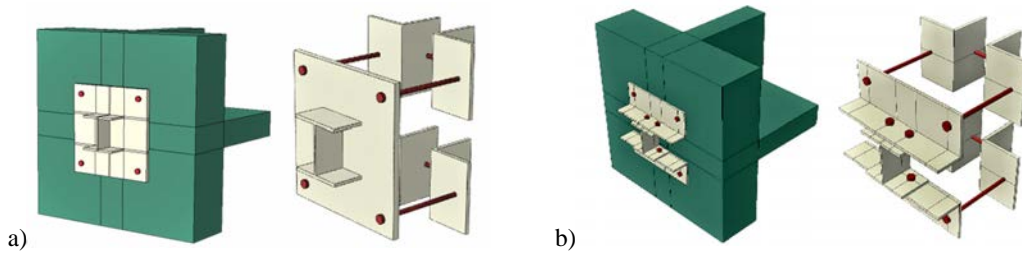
(a) Semi-rigid connection (welded extended header plate) and (b) pinned connection (bolted seating angles).
